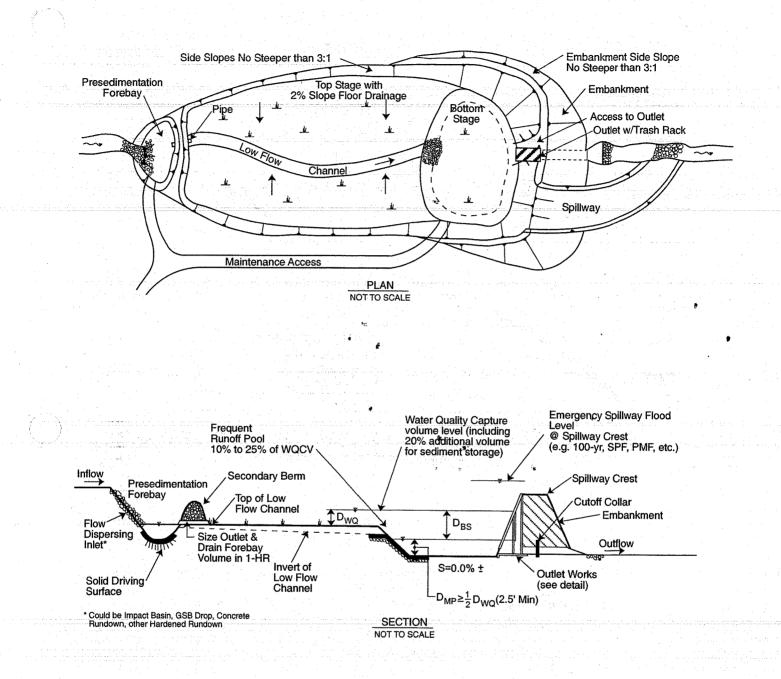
Plan and Section of an Extended Detention Basin Sedimentation Facility
